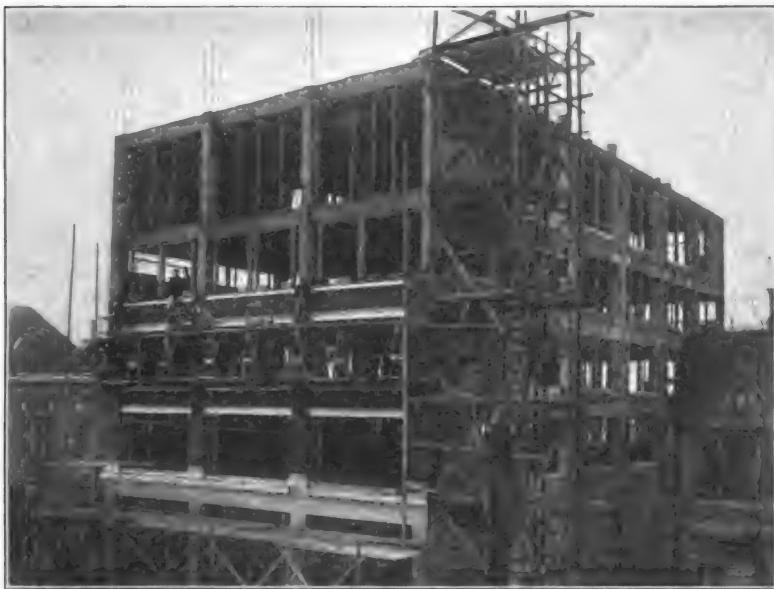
Rogers and Hall Co.'s building, Chicago, Ill.
